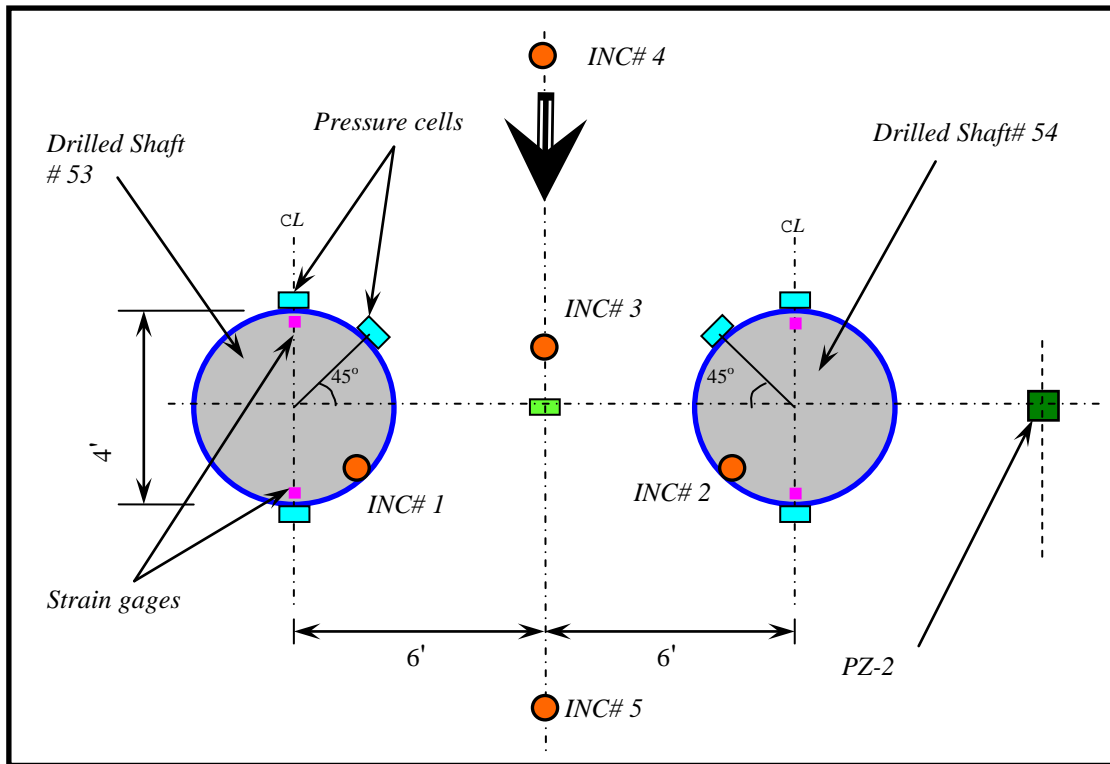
Plan View of Pressure Cell Locations Inside Drilled Shafts and on Ground at WAS-7 Site
